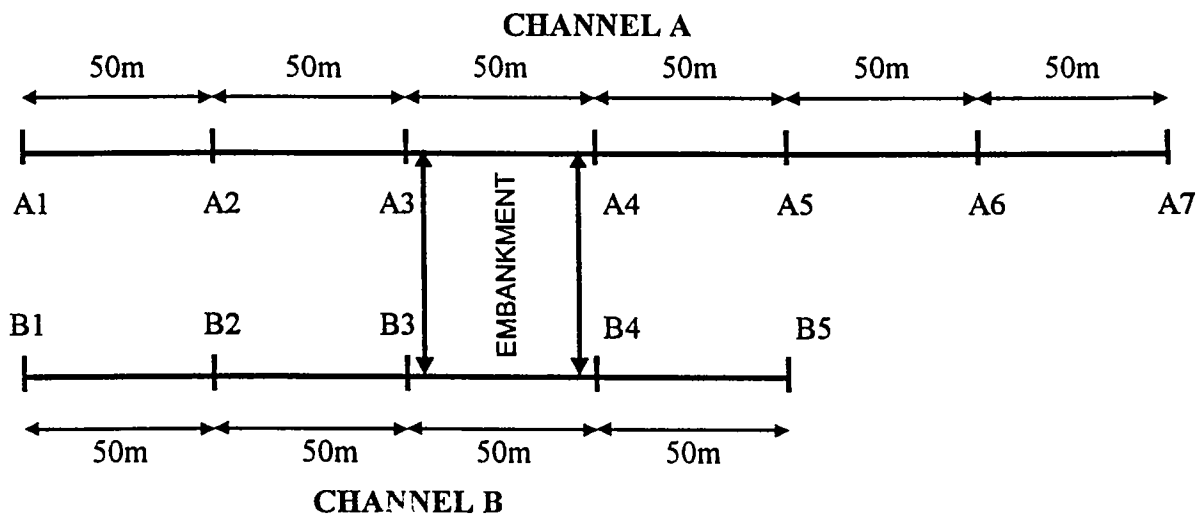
TEST 1 Part B - Plan location of cross-sections
